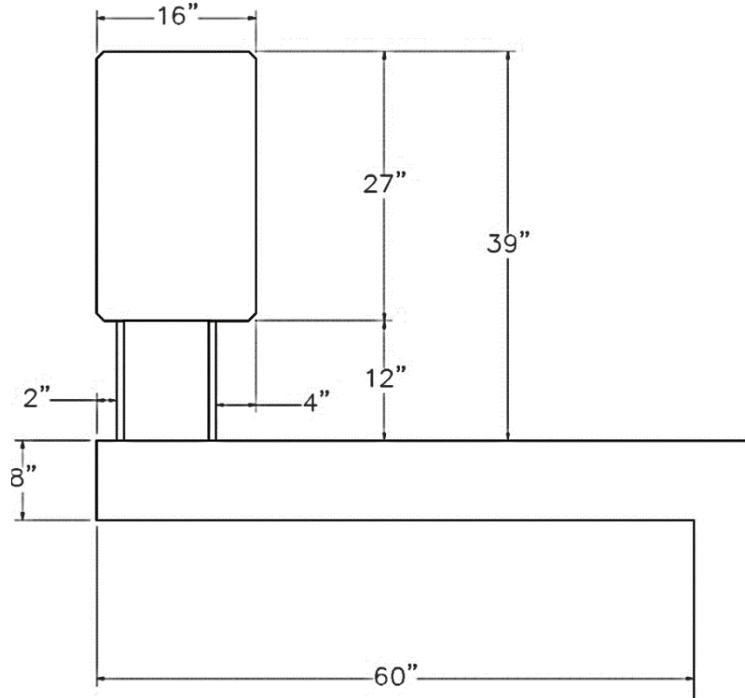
Preliminary Open Concrete Bridge Rail and Deck Cross Section
